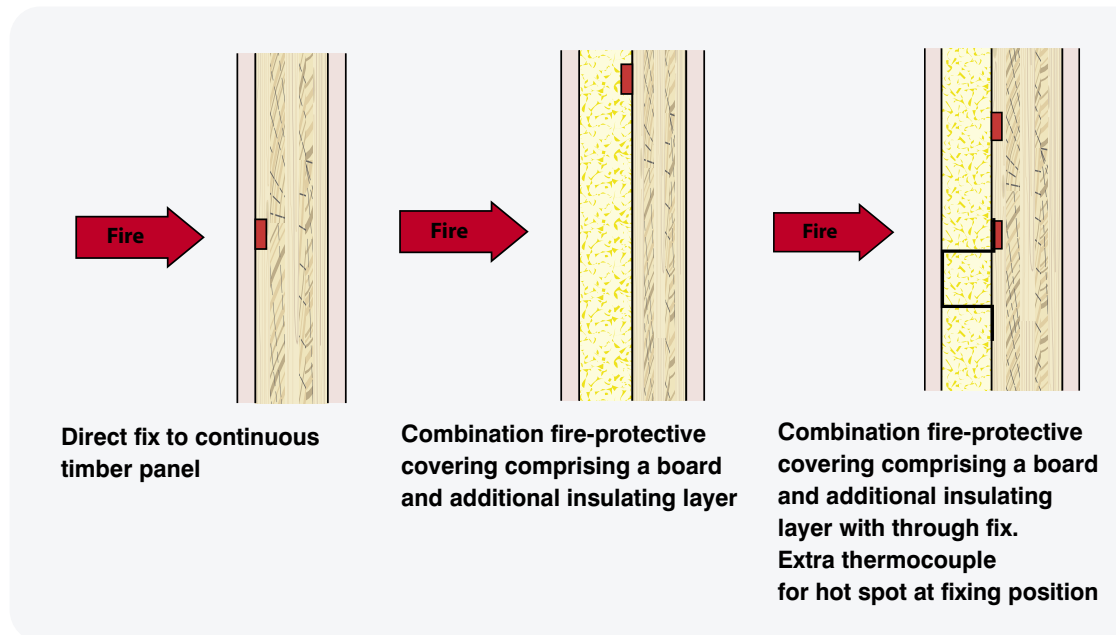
Modified RISF thermocouple positions for typical specimen configurations.
